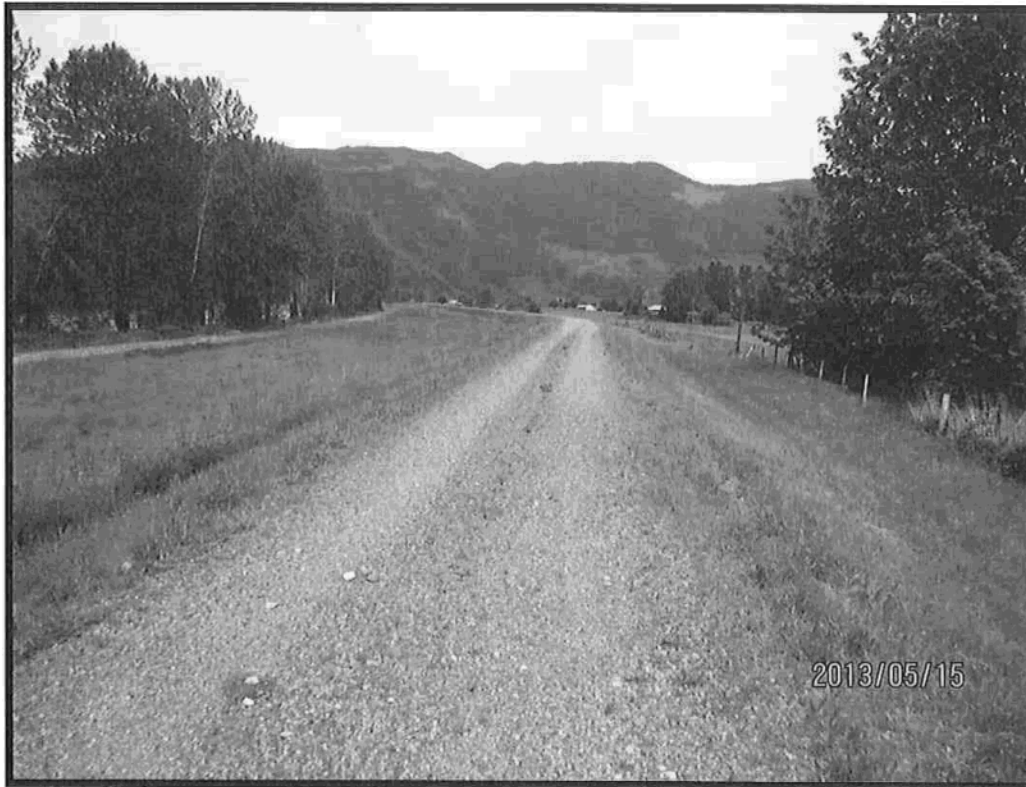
Looking east at Dike A towards Station 193+23 (May 15, 2013)
